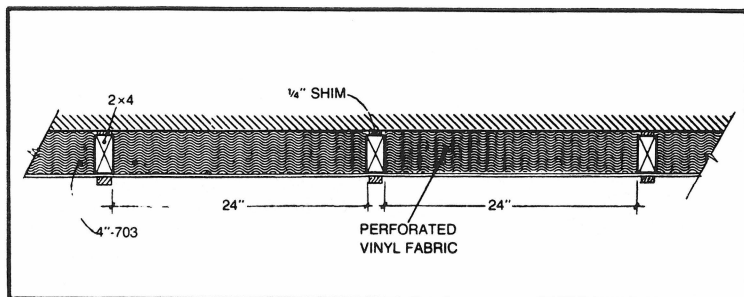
Detail of rear (west) wall treatment. The 2×4 frame is shimmed out about $\frac{1}{4}$ inch to avoid bulging of perforated vinyl fabric face by the glass fiber board.
